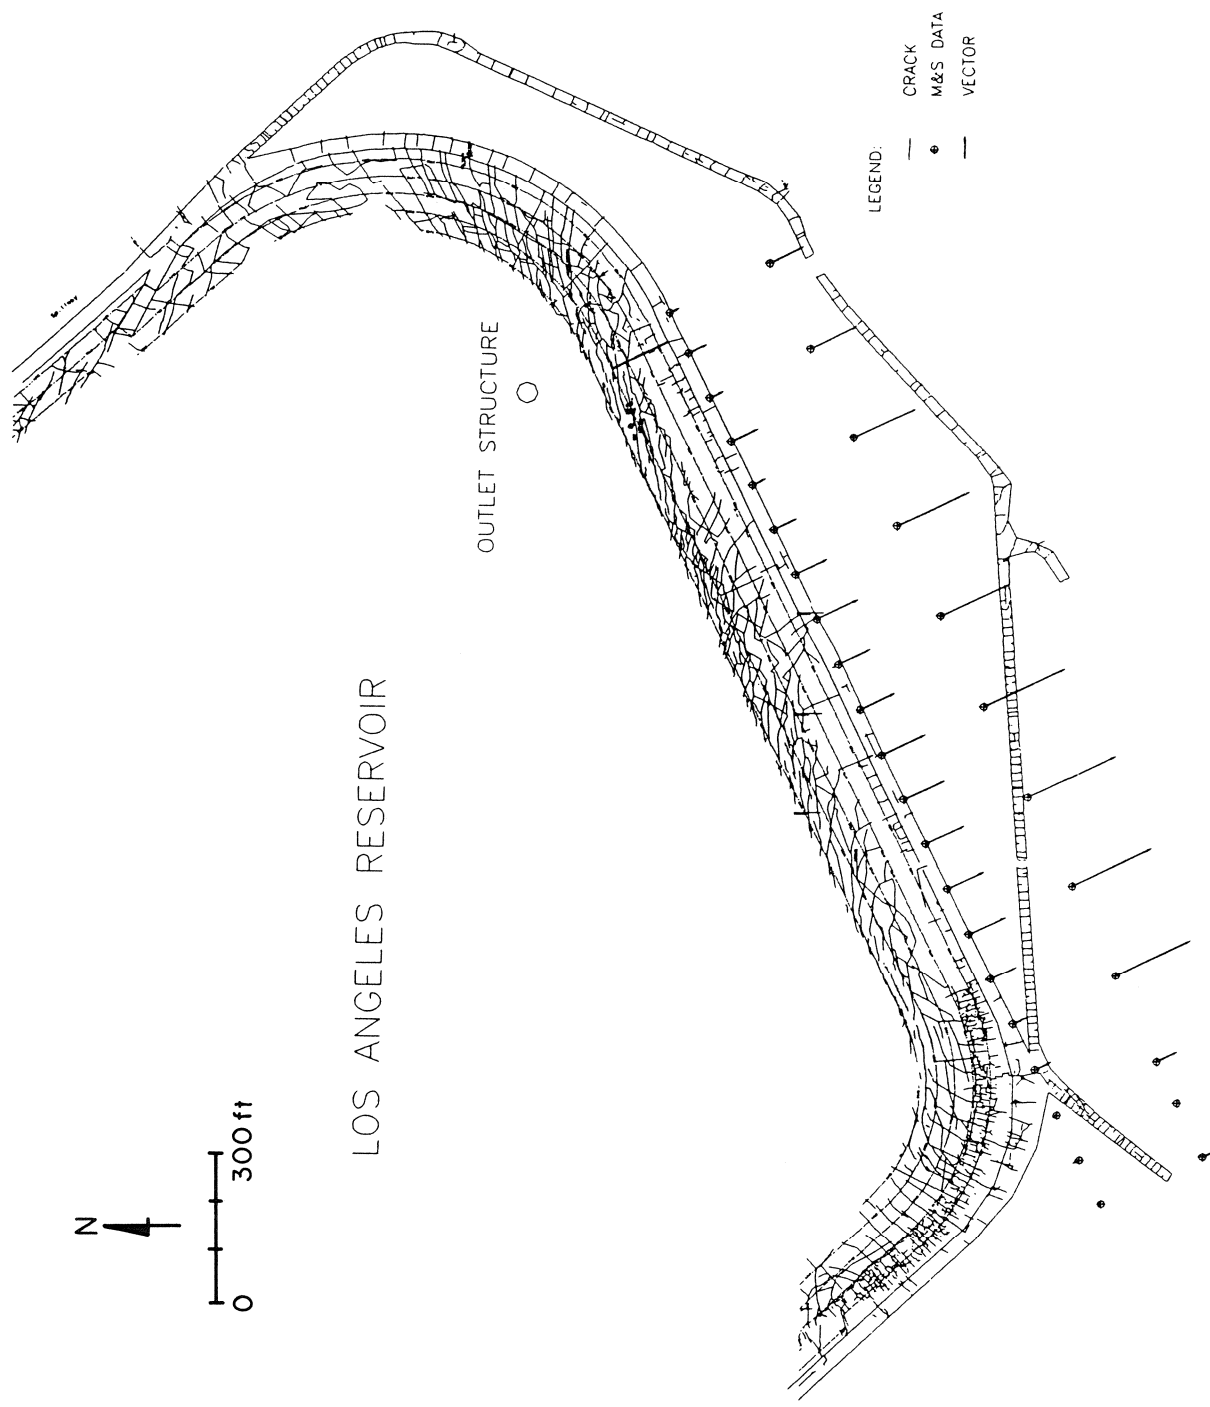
Location of cracks in Los Angeles Reservoir Dam.
